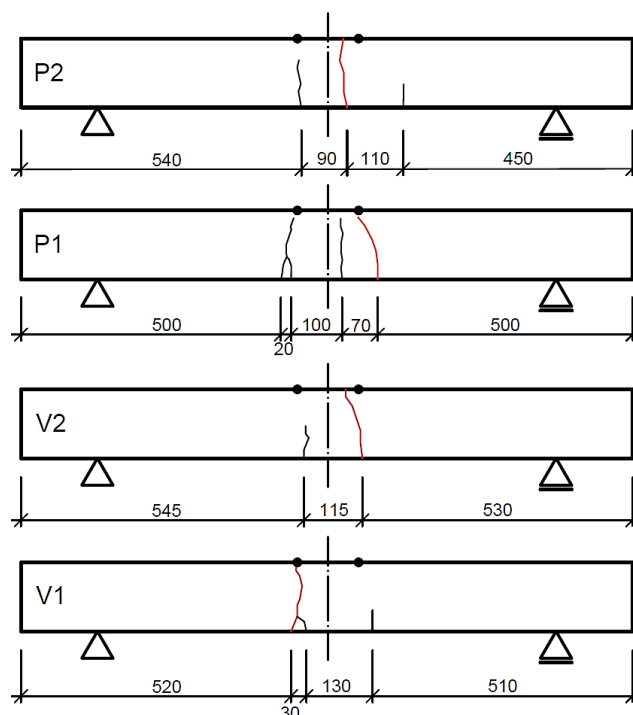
Location of cracks on beams P1, P2, V1 and V2.
